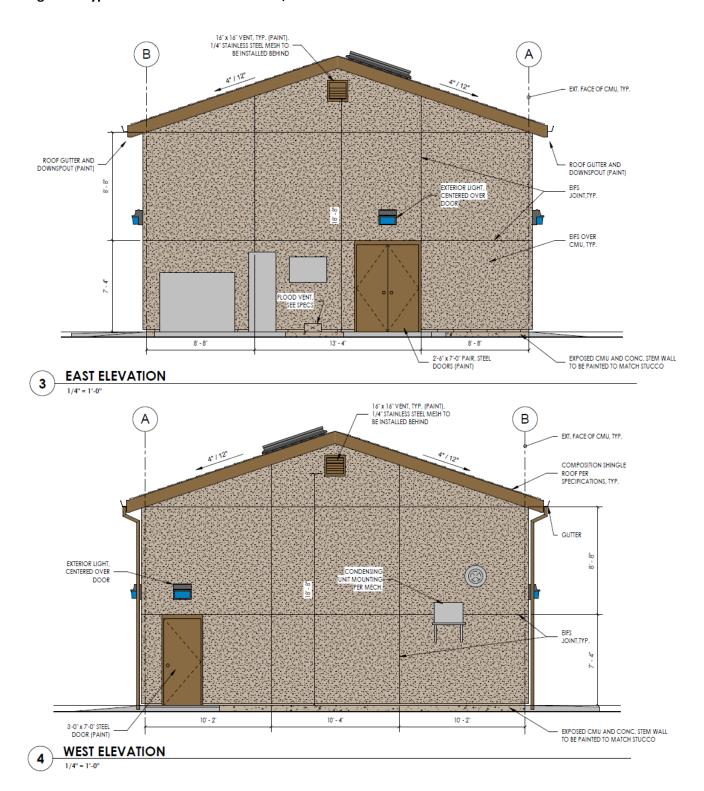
Typical Floor Plan and Elevations; full size plans submitted with application
